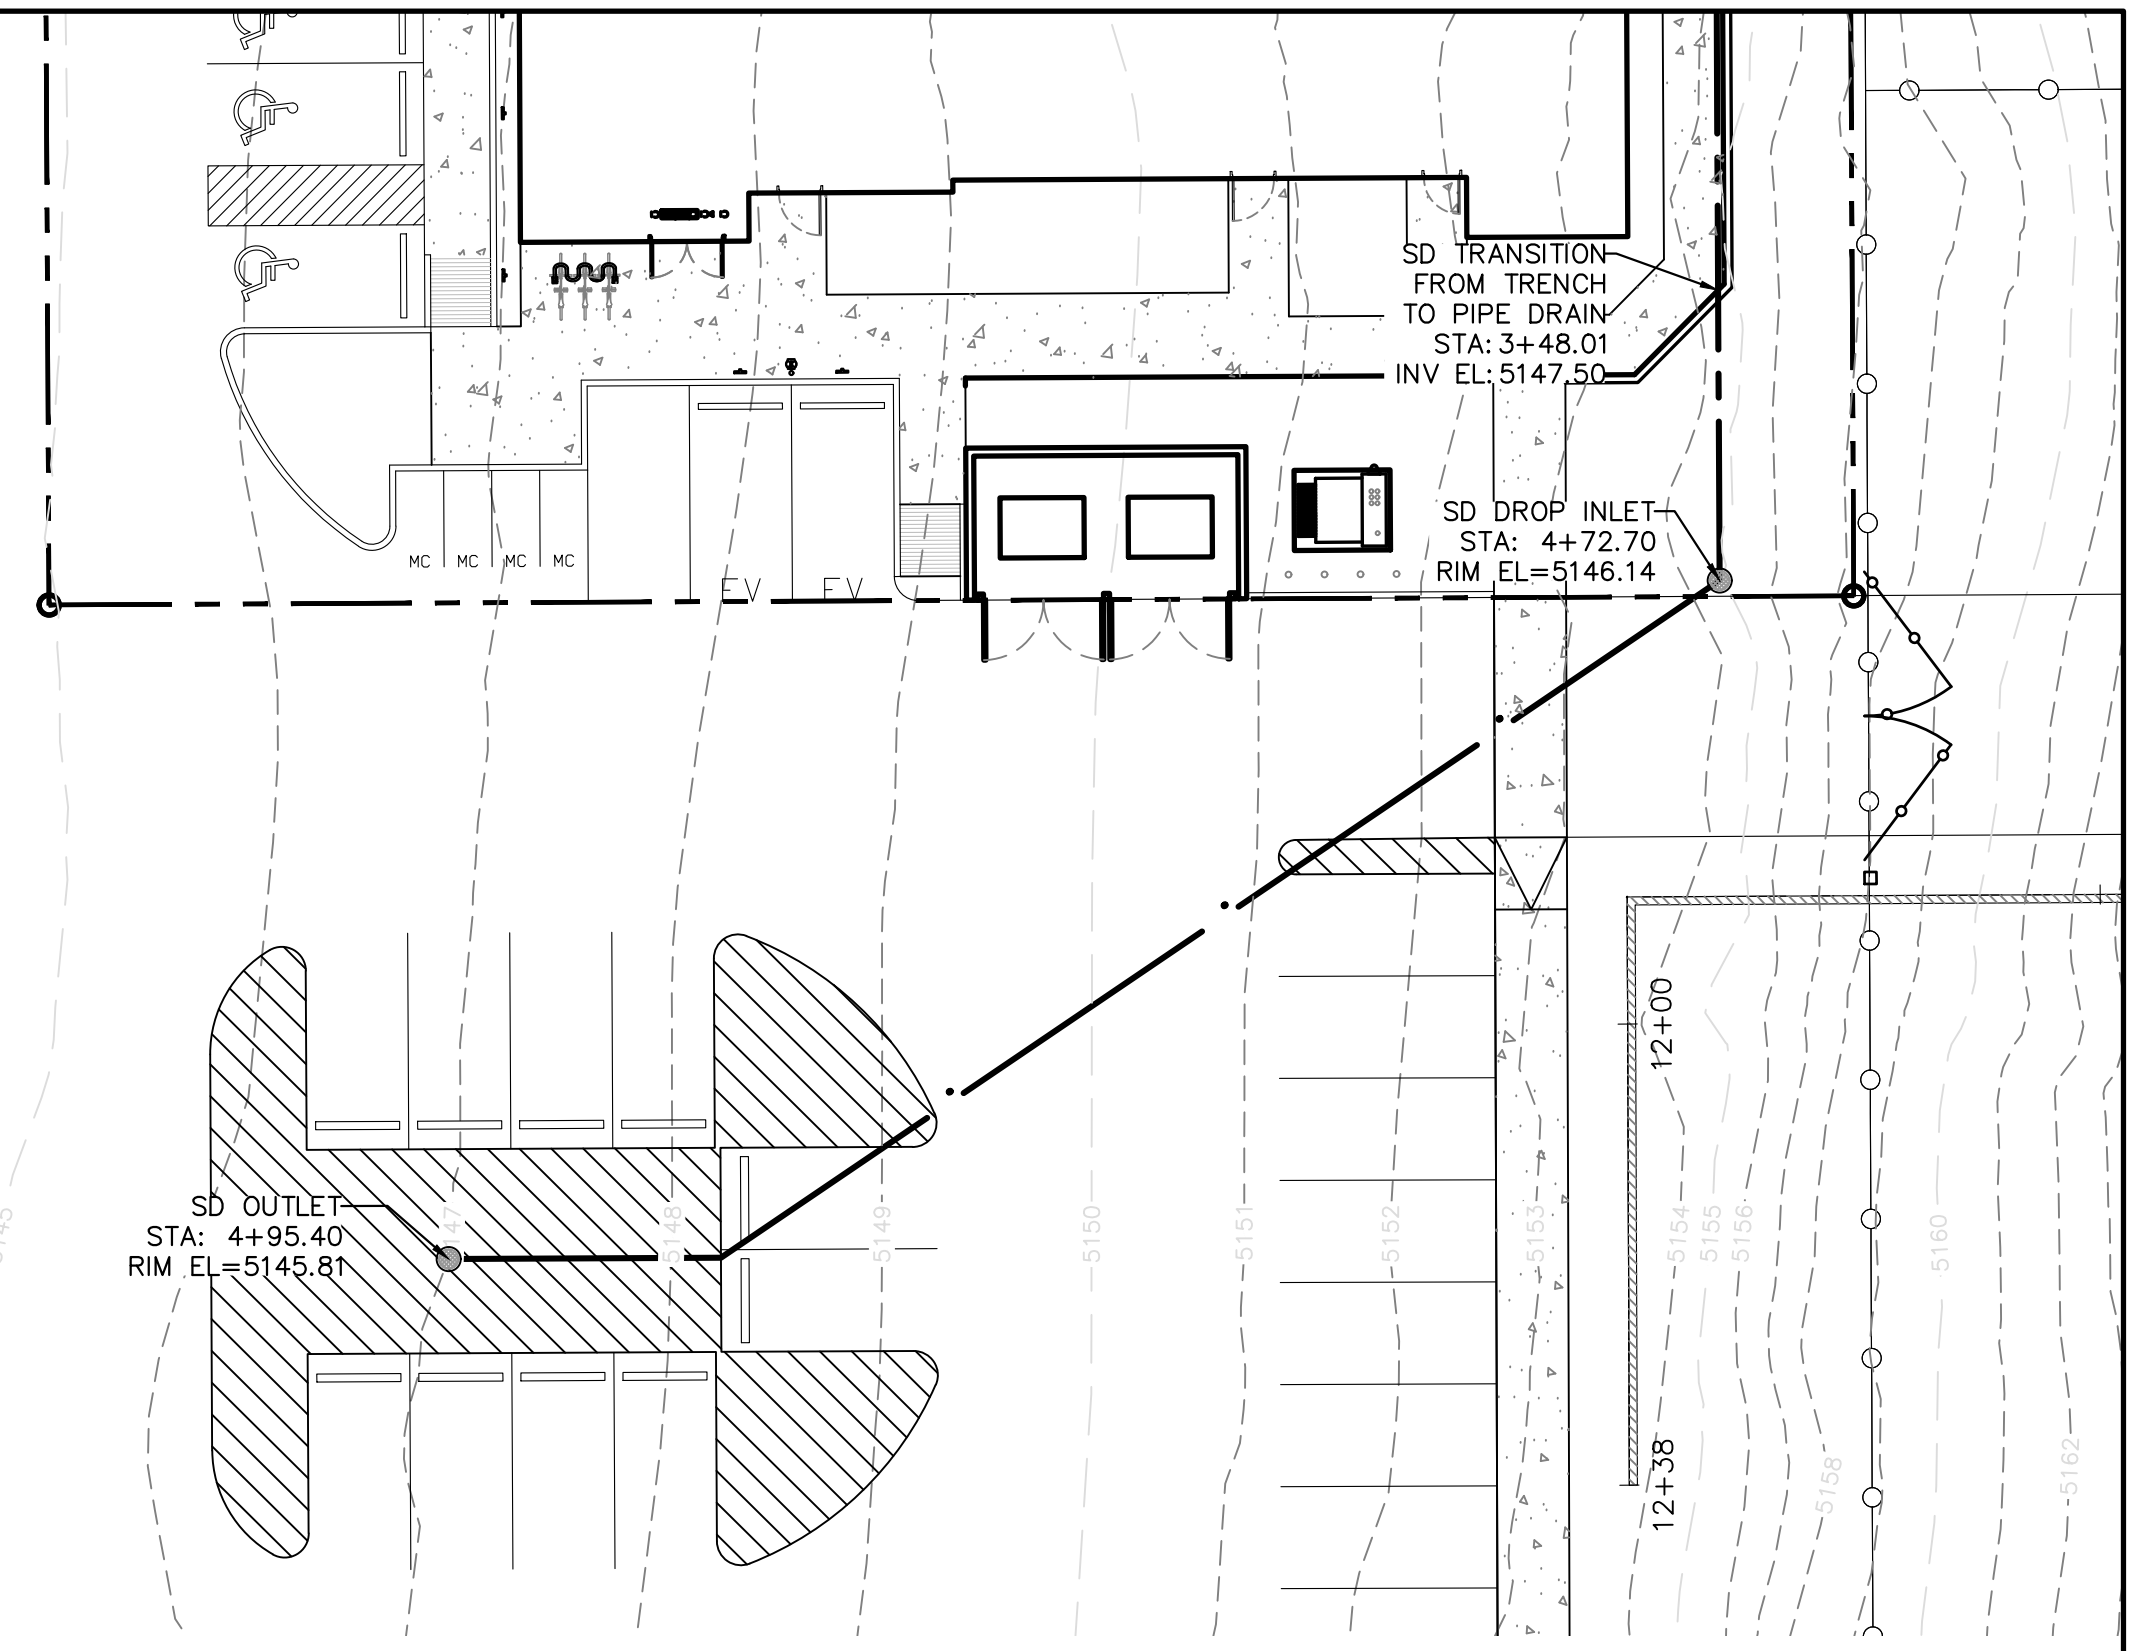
DETAIL B-B - ON-SITE STORM DRAIN SYSTEM
